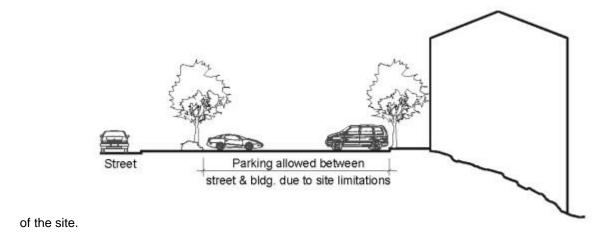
(C): Example of parking location between the building and the street, which is necessary due to the steep slope.
